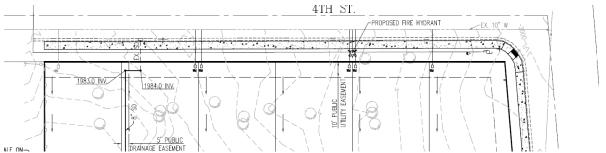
The frontage along 4th Street and North Hyland currently does not contain sidewalks, curb, and gutter. Sidewalks, curbs, and gutters will be required.
